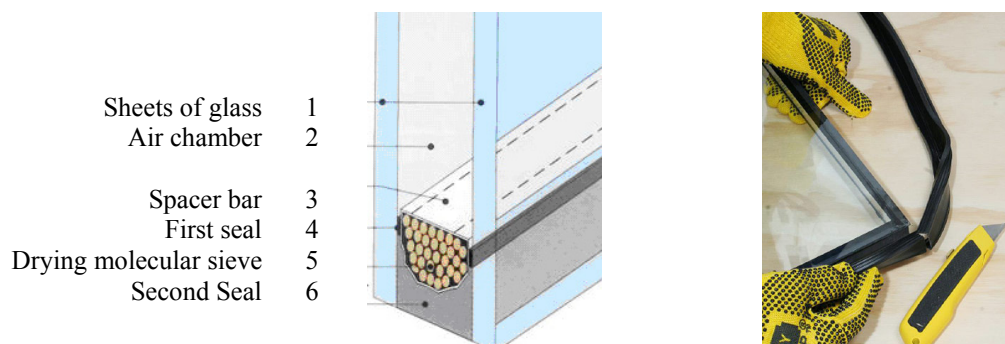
Detailed view of glazing with an air chamber and the process of removing a seal
